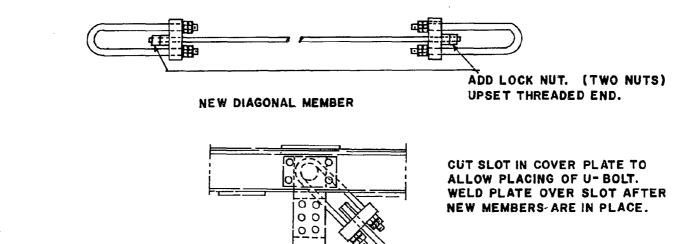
TRUSS DIAGONAL REPLACEMENT FOR PINNED END CONNECTIONS
